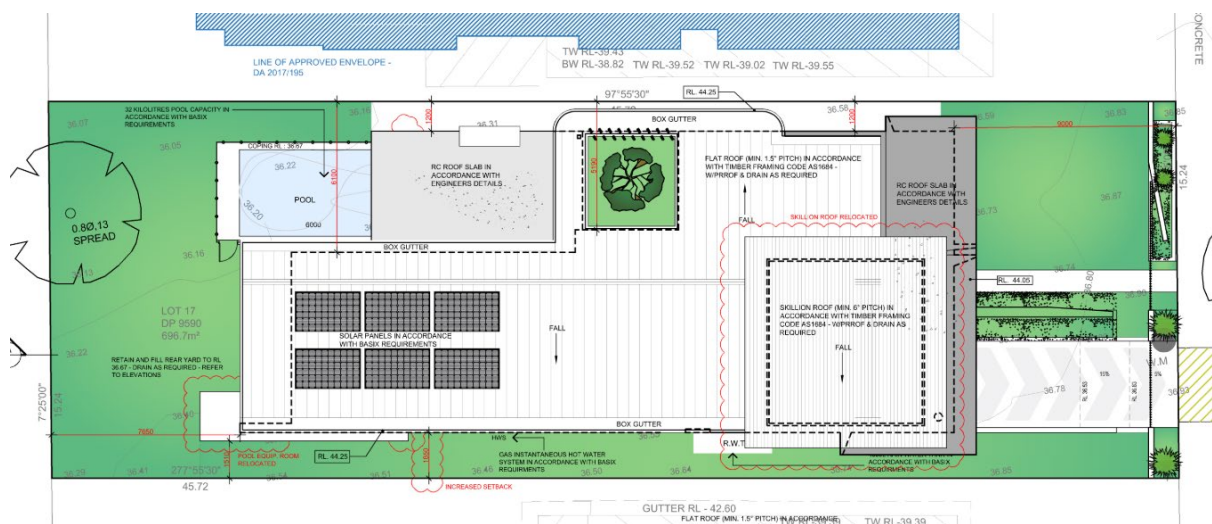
Extract of the site plan, (source: Vision Group Architects, sheet 02 issue C, dated Feb. 2021).
